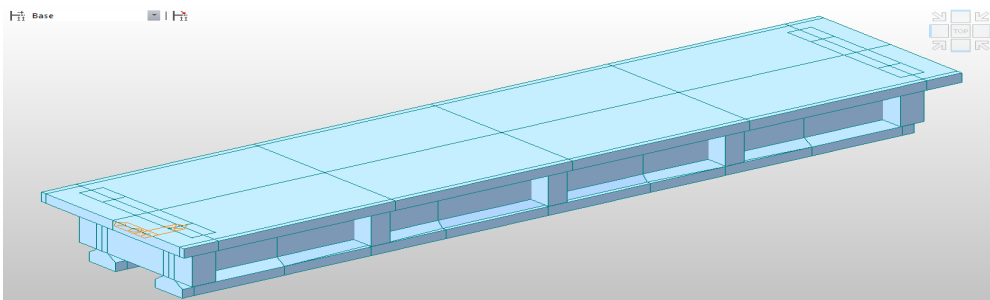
Modelling of Railway Bridge in MIDAS Civil for 19.76 m span
